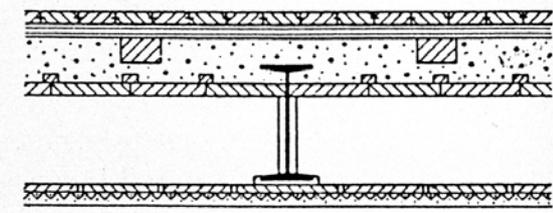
Composite iron-concrete floor structure using I-beams. (Pauser)
